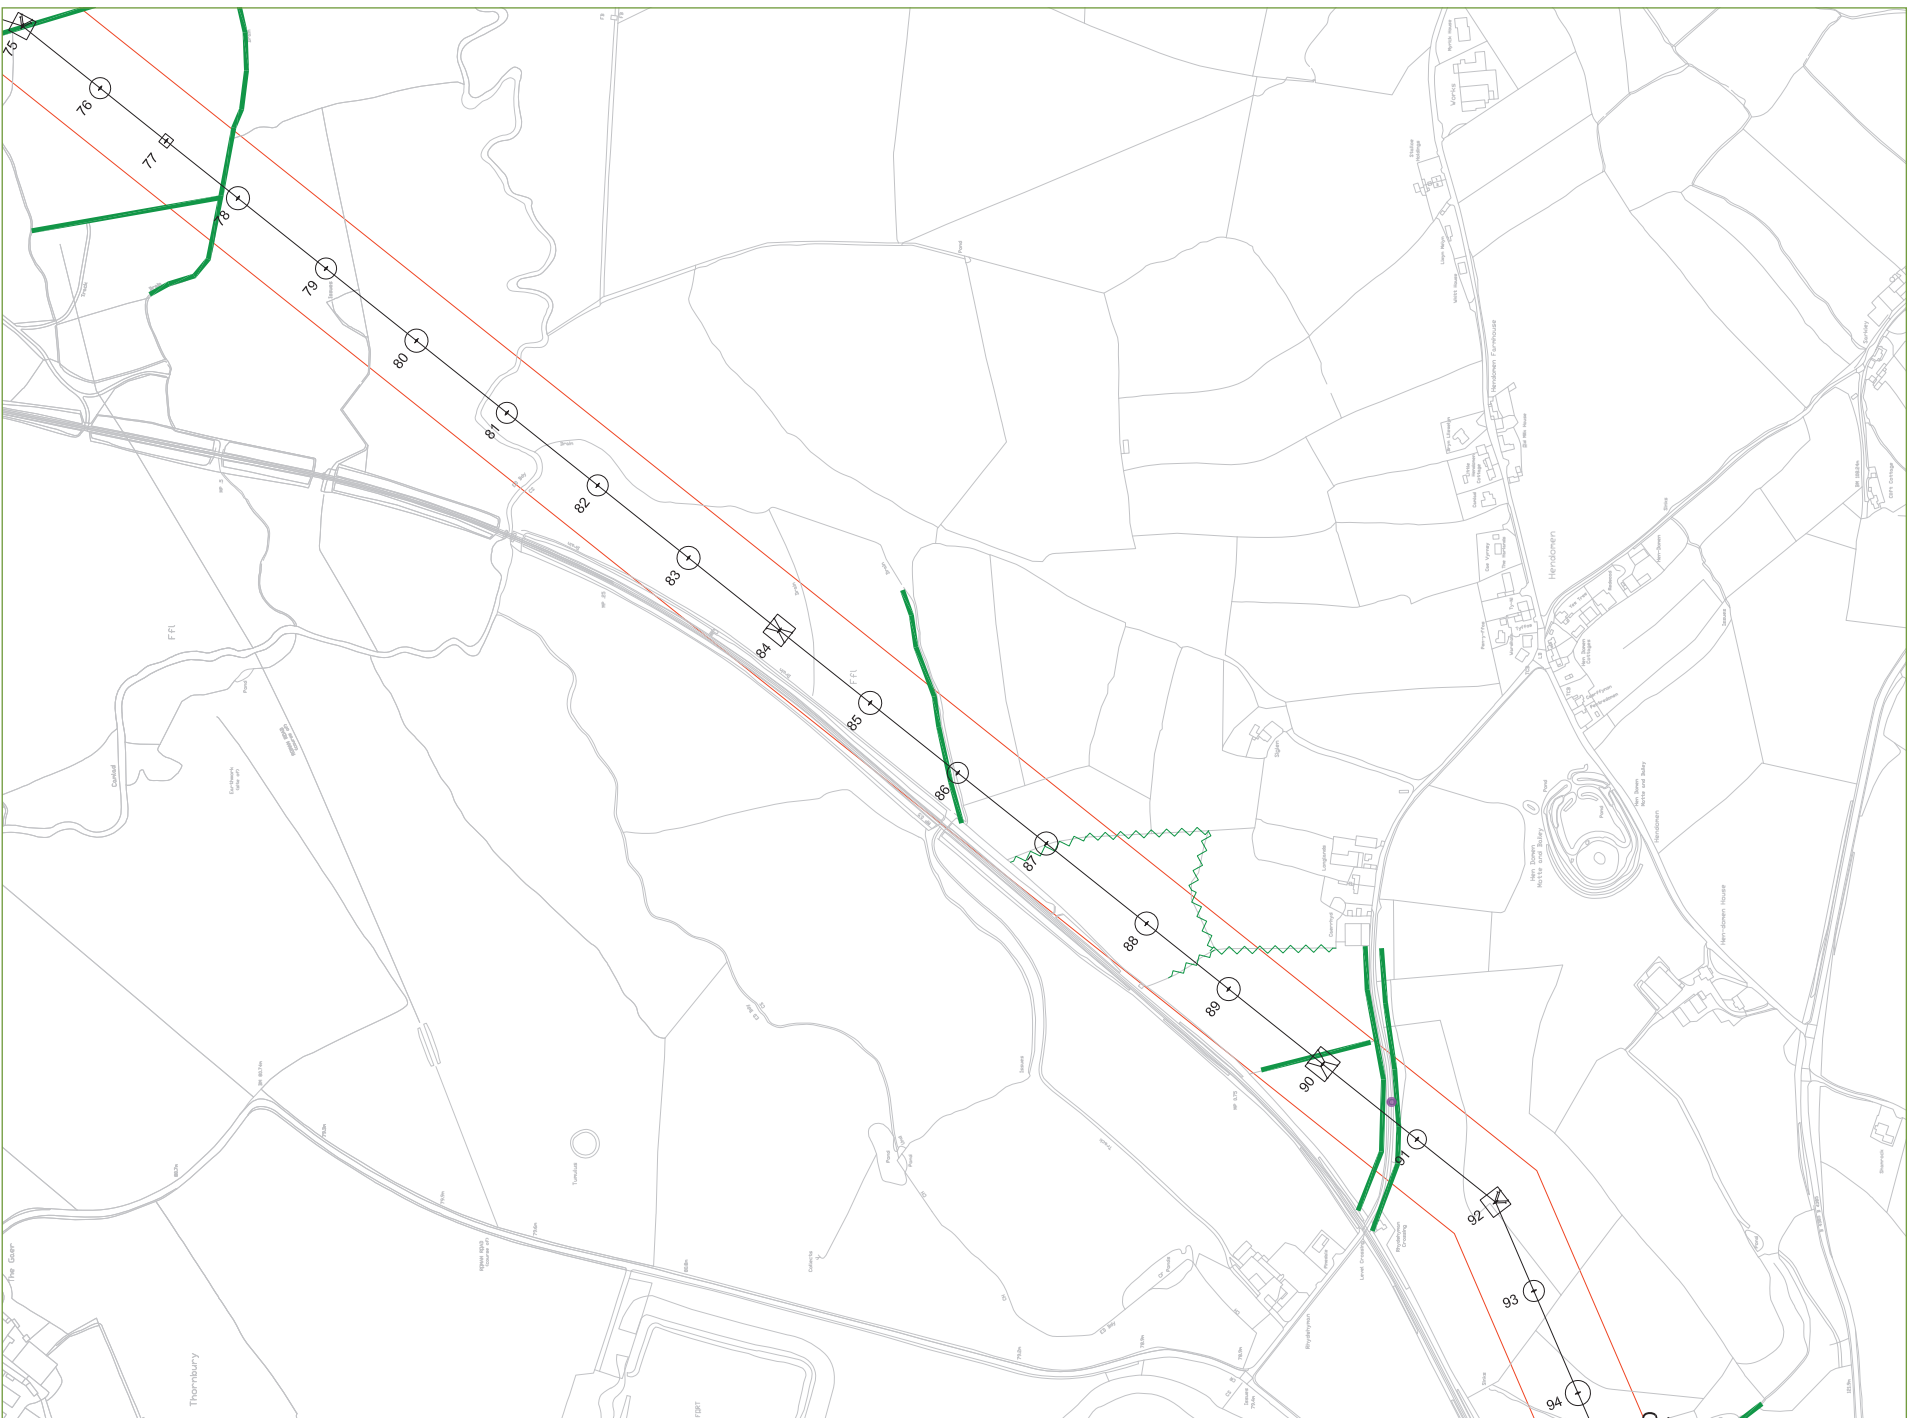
Hedgerow Plan Sheet 5 of 20
